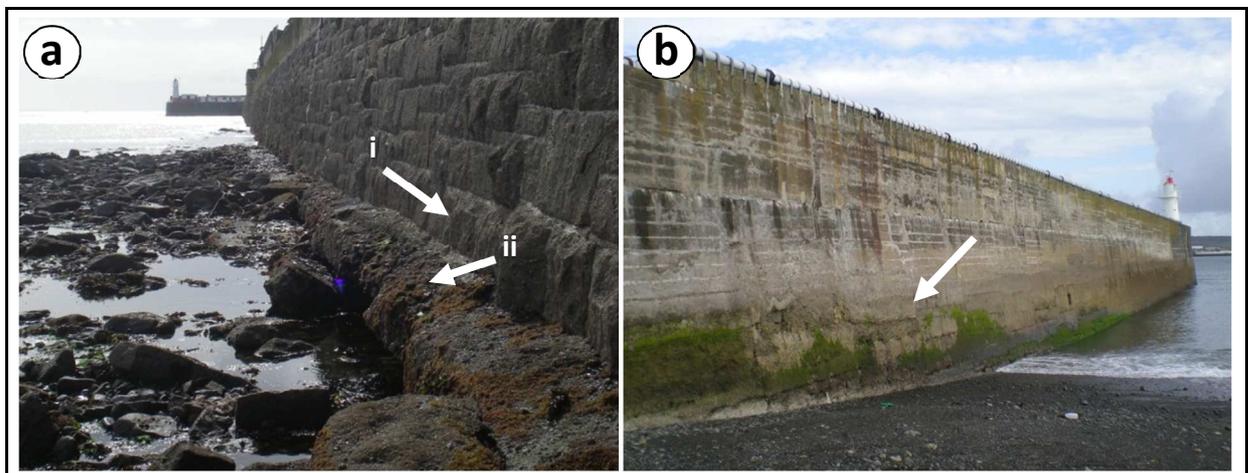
2 Location of samples taken from structures at Newlyn Harbour, Cornwall: (a) granite facing (arrow i) and concrete foundations (arrow ii) and of North Pier, and (b) concrete wall of South Pier.
